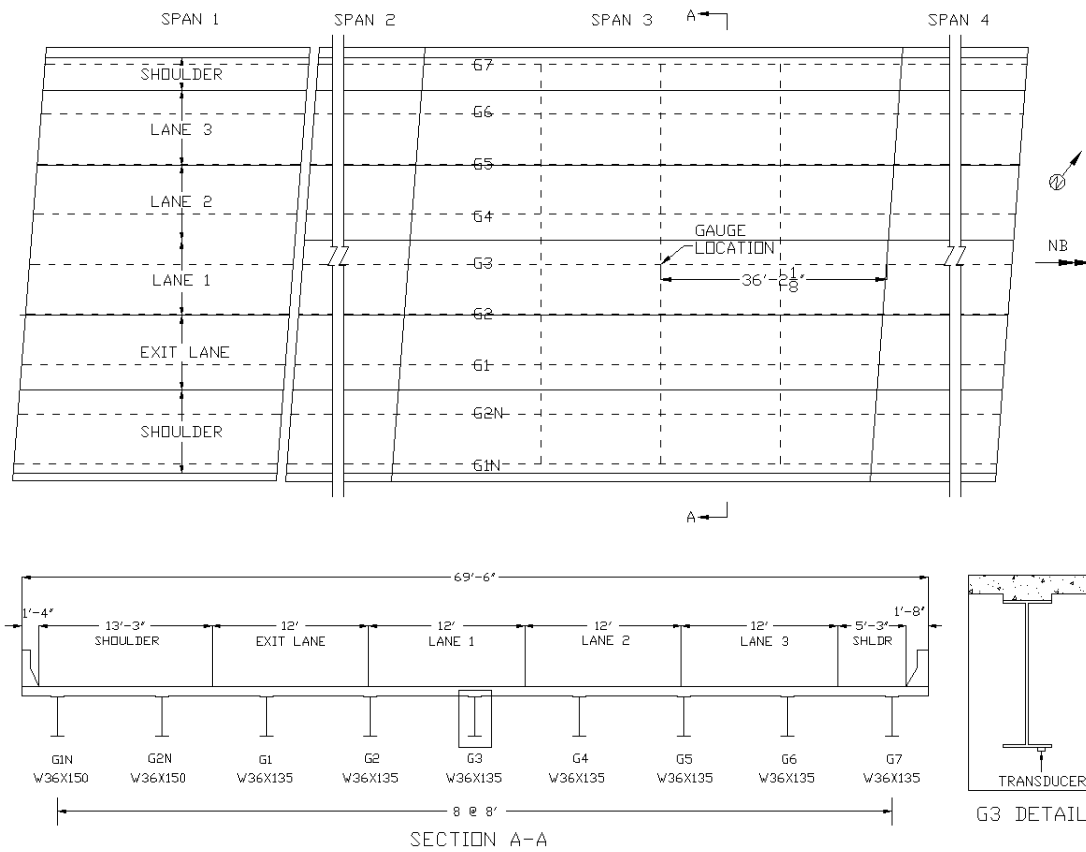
Bridge 1-911 S plan, cross-section and Girder 3 detail
